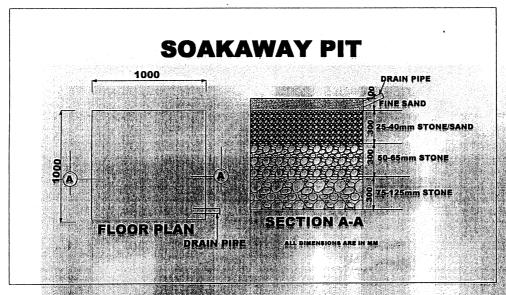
; Floor Plan and Cross Section of the Soak away Pit
